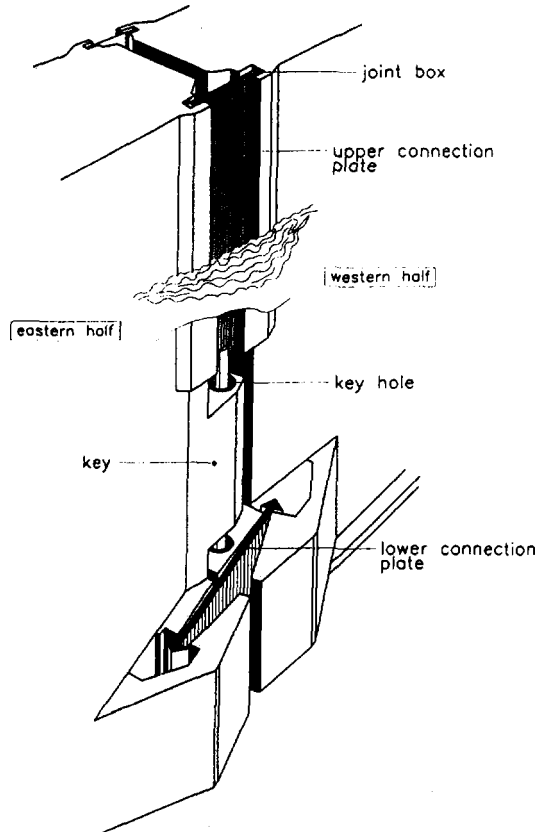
New connection "steel plate and prepared box" concept for the connection between the half units
